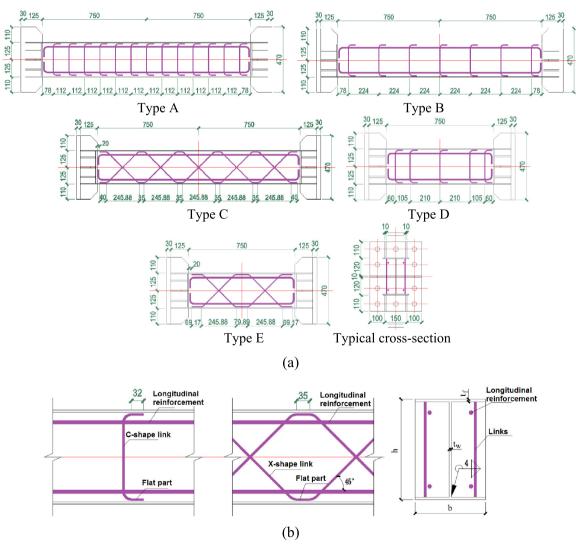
Test specimens: a) geometric configurations, b) details of links.
